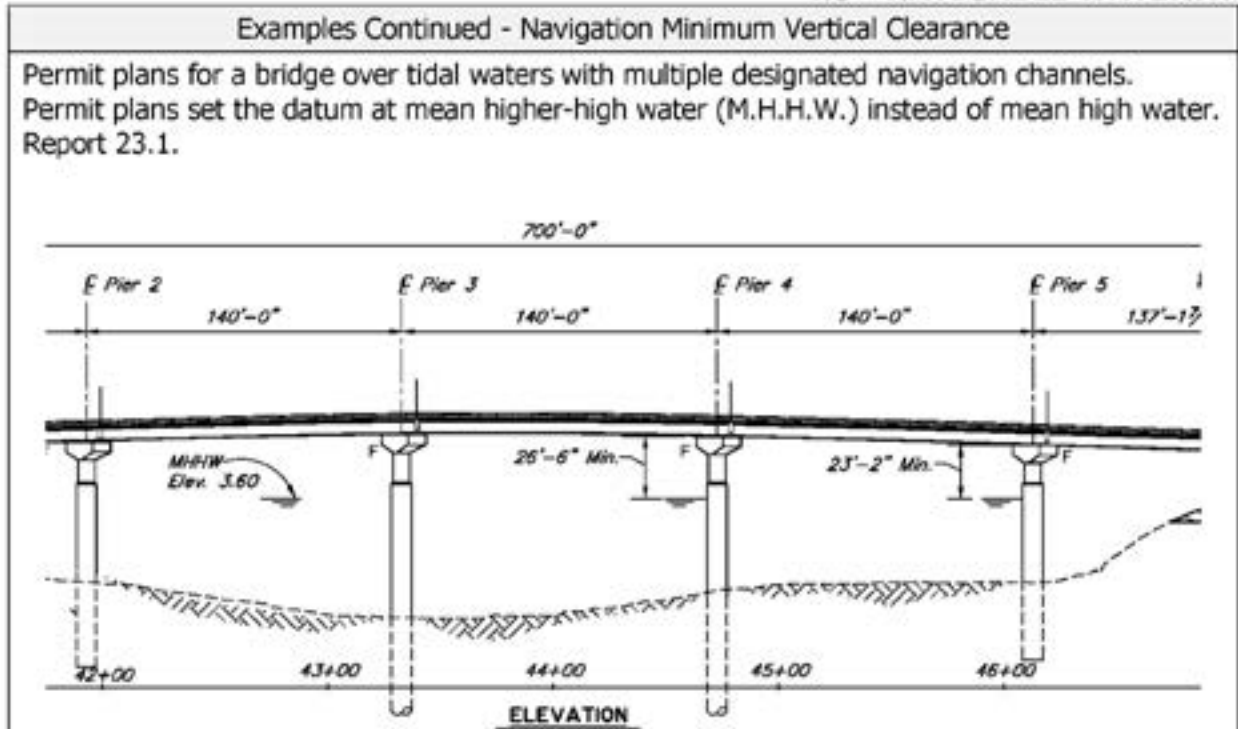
Bridge elevation view indicating multiple navigation channels and vertical clearances. (Source: Alaska DOT)
